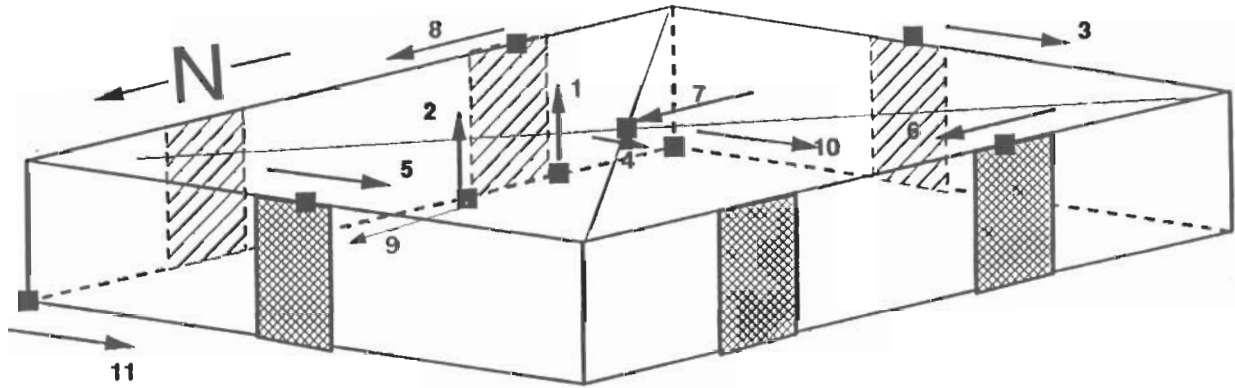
West Valley College Gymnasium, Roof Plan and Instrument Layout
